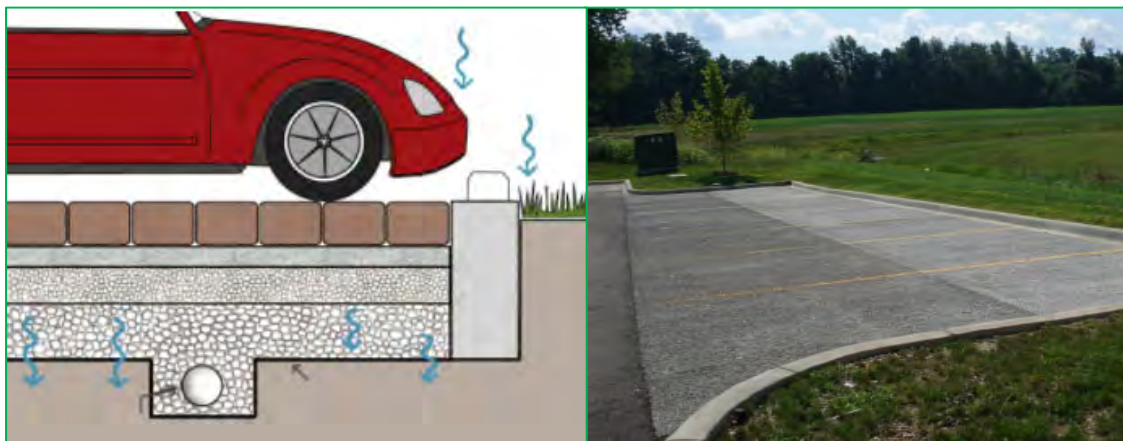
TYPICAL INTERLOCKING PERVIOUS PAVER SECTION VIEW (LEFT) AND A PERVIOUS PAVEMENT FACILITY (RIGHT)
